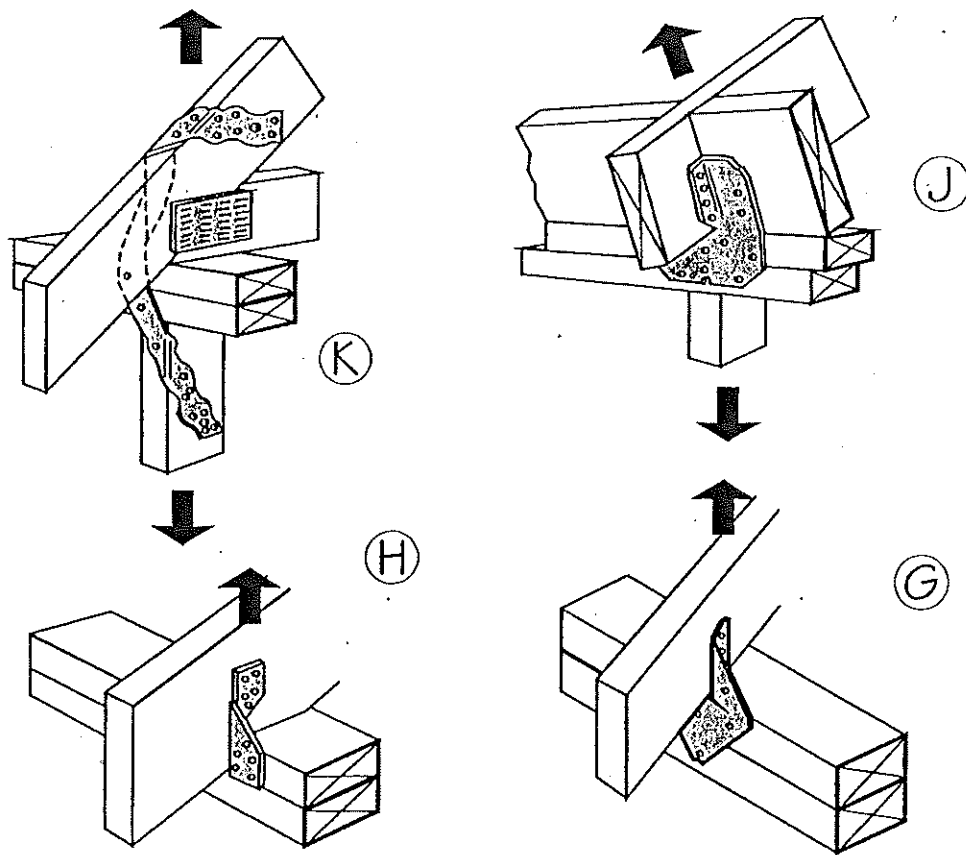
RAFTER/TRUSS CONNECTIONS TO DOUBLE PLATE
